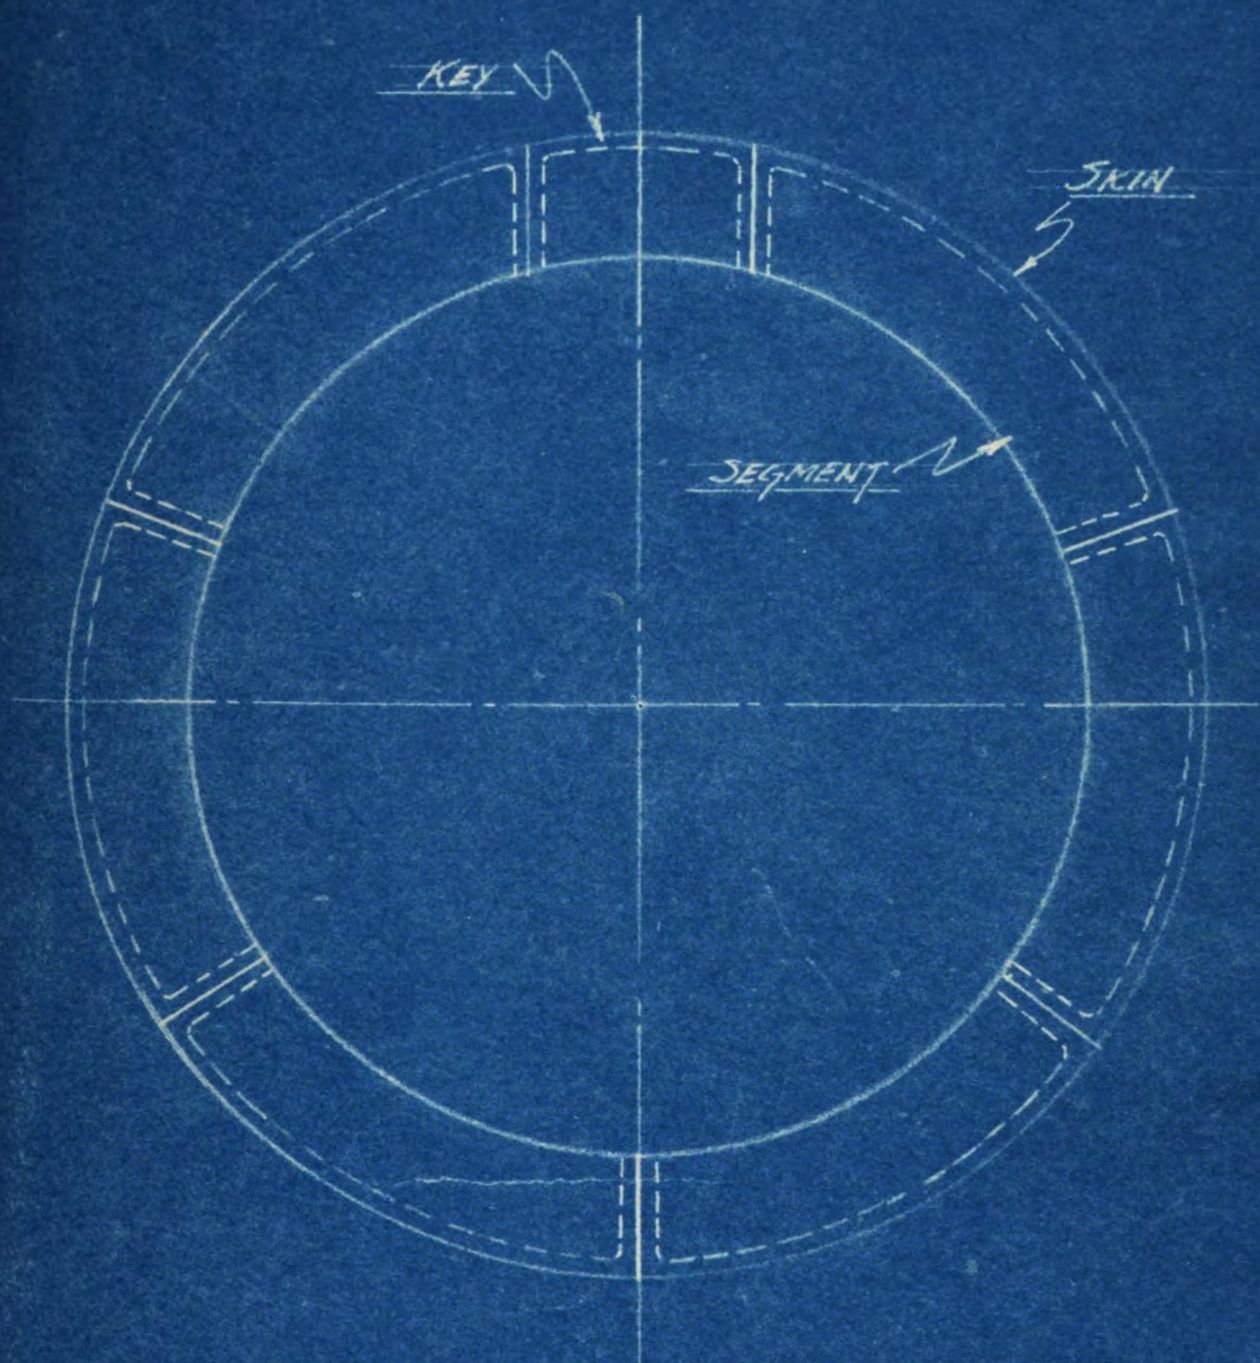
TYPICAL 6 SEGMENT AND KEY TUNNEL LINING
